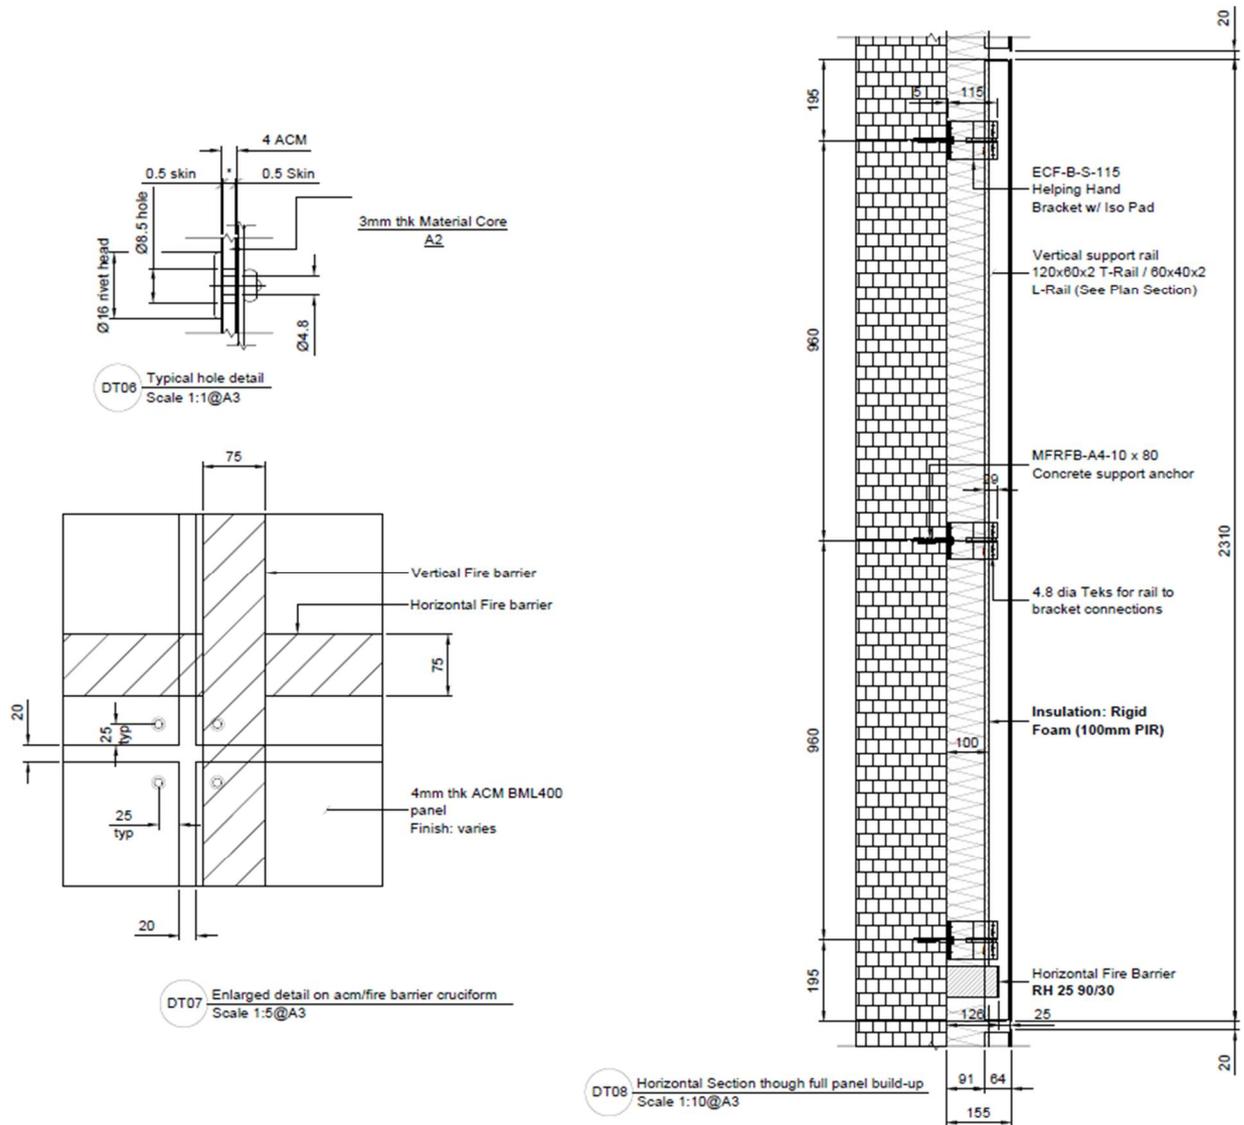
Vertical section through the cladding system, ACM panel detail and vertical and horizontal cavity barriers intersection (supplied by the Test Sponsor).
